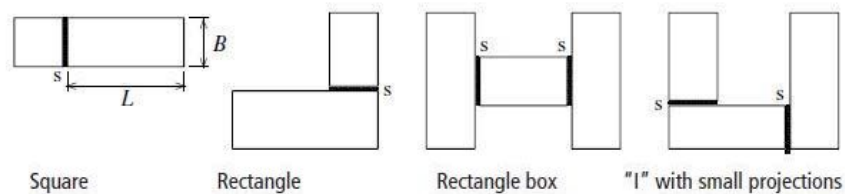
PLAN OF BUILDING BLOCKS (SOURCE: GUIDELINES FOR EARTHQUAKE RESISTANT NON-ENGINEERED CONSTRUCTION, UNESCO)
